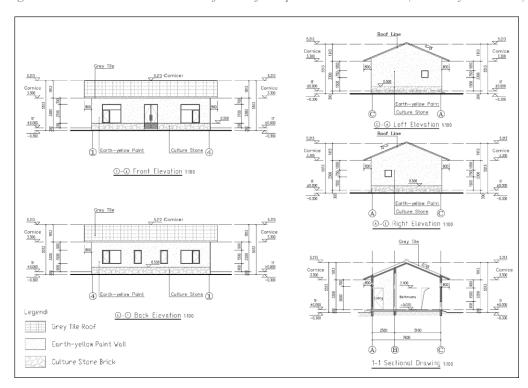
Four Elevations and Sectional Drawing of Sample Guest Room No. 1 (Drawn by the author)
